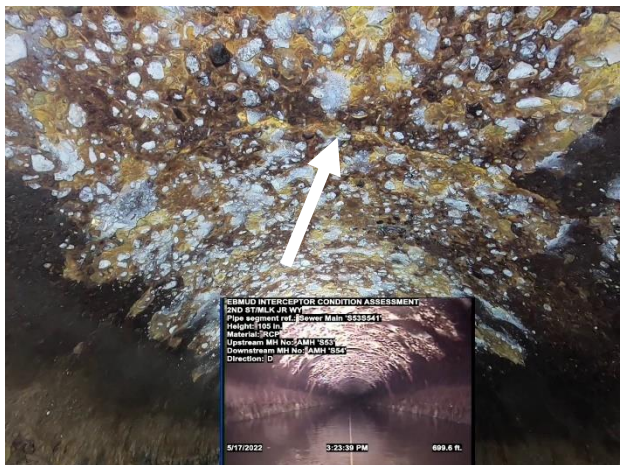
Circumferential crack at 699 feet downstream from S53
